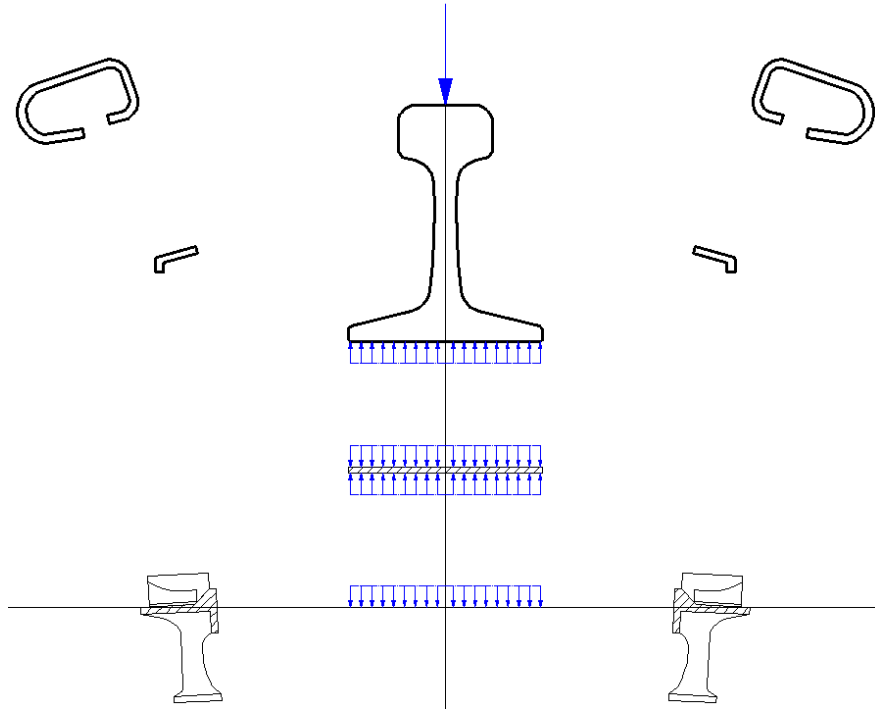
Concrete cross-tie fastening system load path map: case (b), forces due to vertical external load (rigid bodies)
